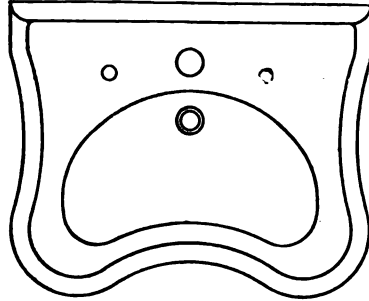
Plan of Lavatory Slab with Crescent or Kidney-Shaped Bowl.
